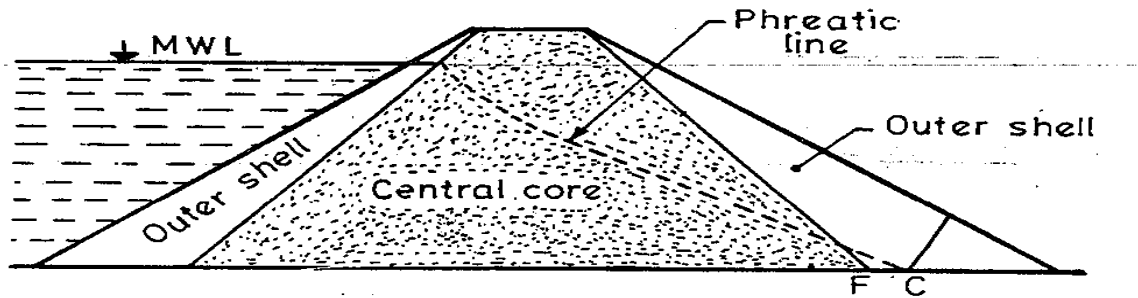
Zoned dam with the center impervious core (Garg, 1987).
